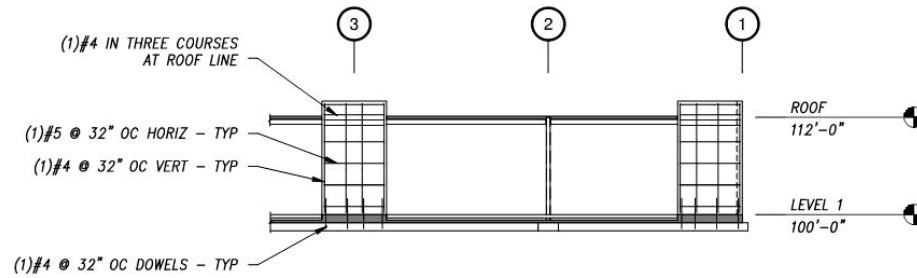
Single-story commercial building North elevation: COM1, COM4, COM7.
